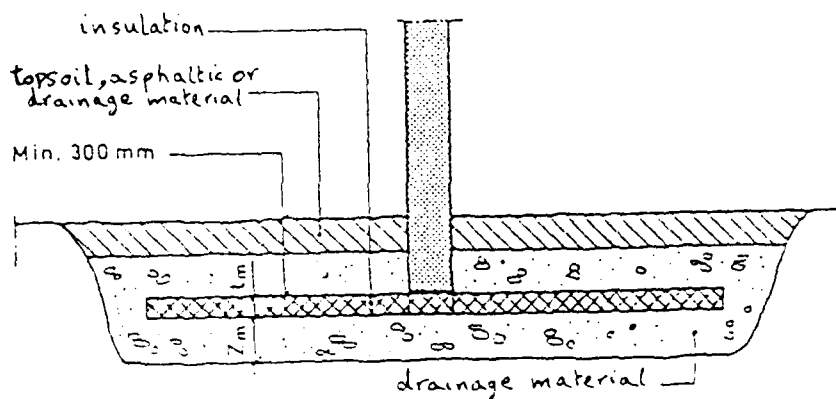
Frost protection of foundation for 'levegger', atrium wall, foundation strip, etc.
